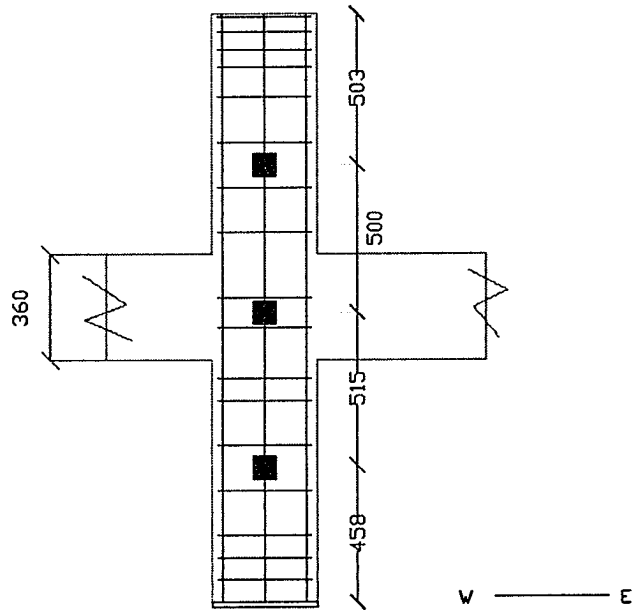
Locations of Concrete Embedded Gages (Group A)
